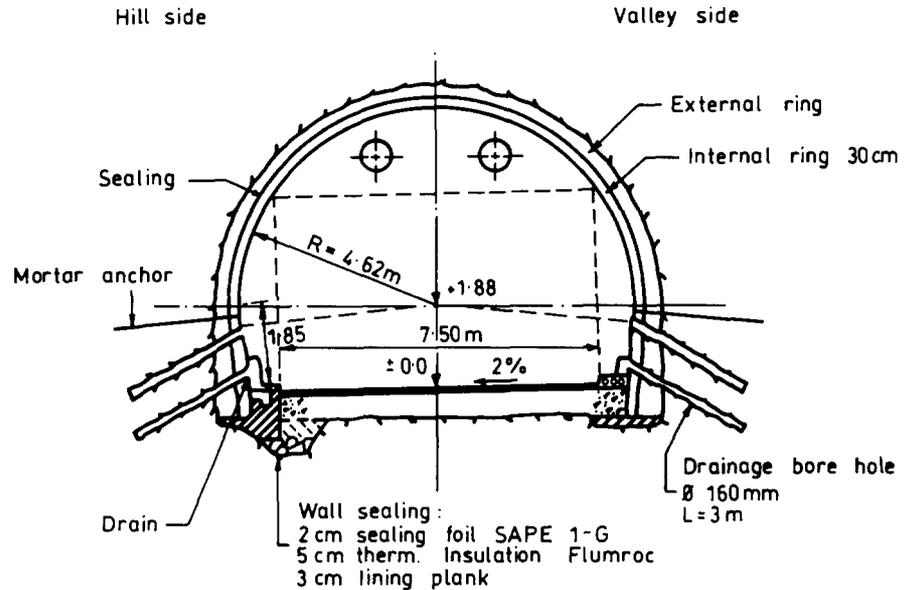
/2. Renovation in the Rofla-Tunnel (34m Tunnel test section)
